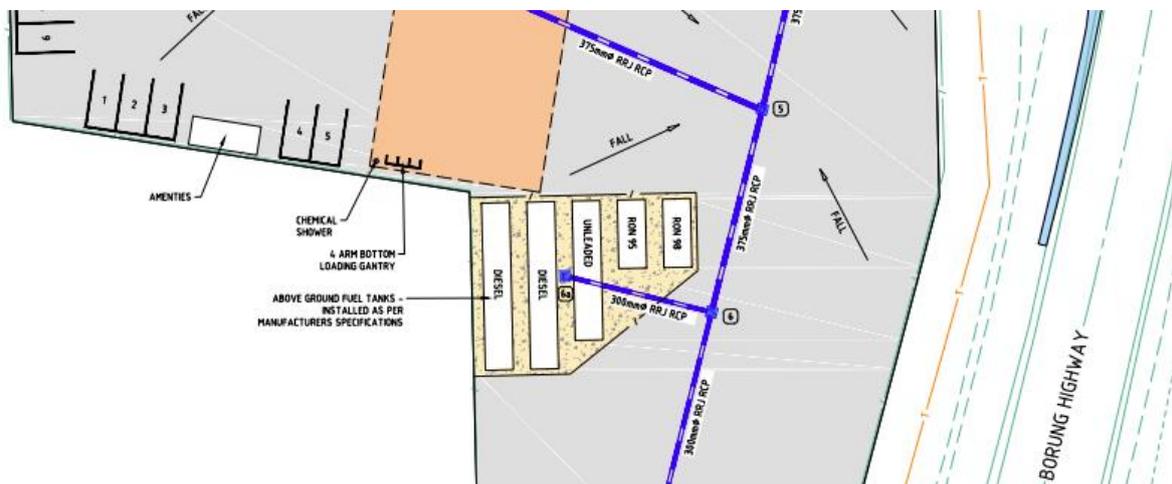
Fuel Storage holding area – extracted from Layout Plan prepared by CAF Consulting 16/08/2022
